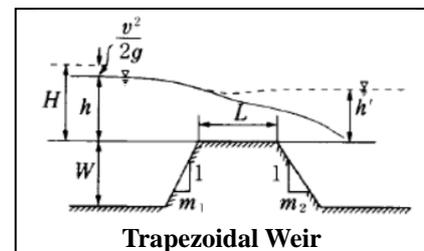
Principal Specifications of Existing Spillway of Lake Tonle Bati and Downstream Box Culvert under NR2
